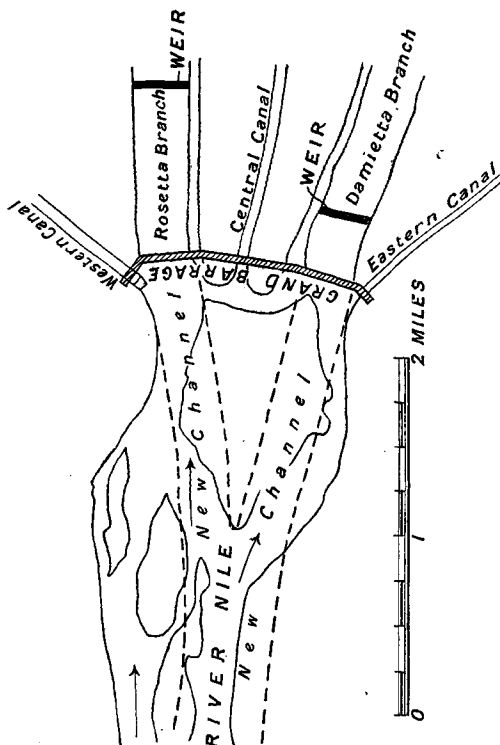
Site Plan of Damietta and Rosetta Weirs.
